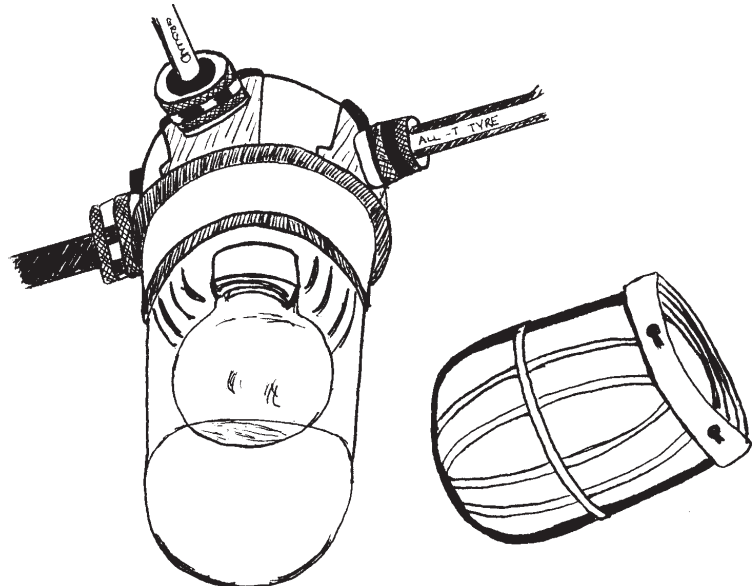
Light Fixture. Dust- and moisture-tight globe and wire cage to protect globe.
